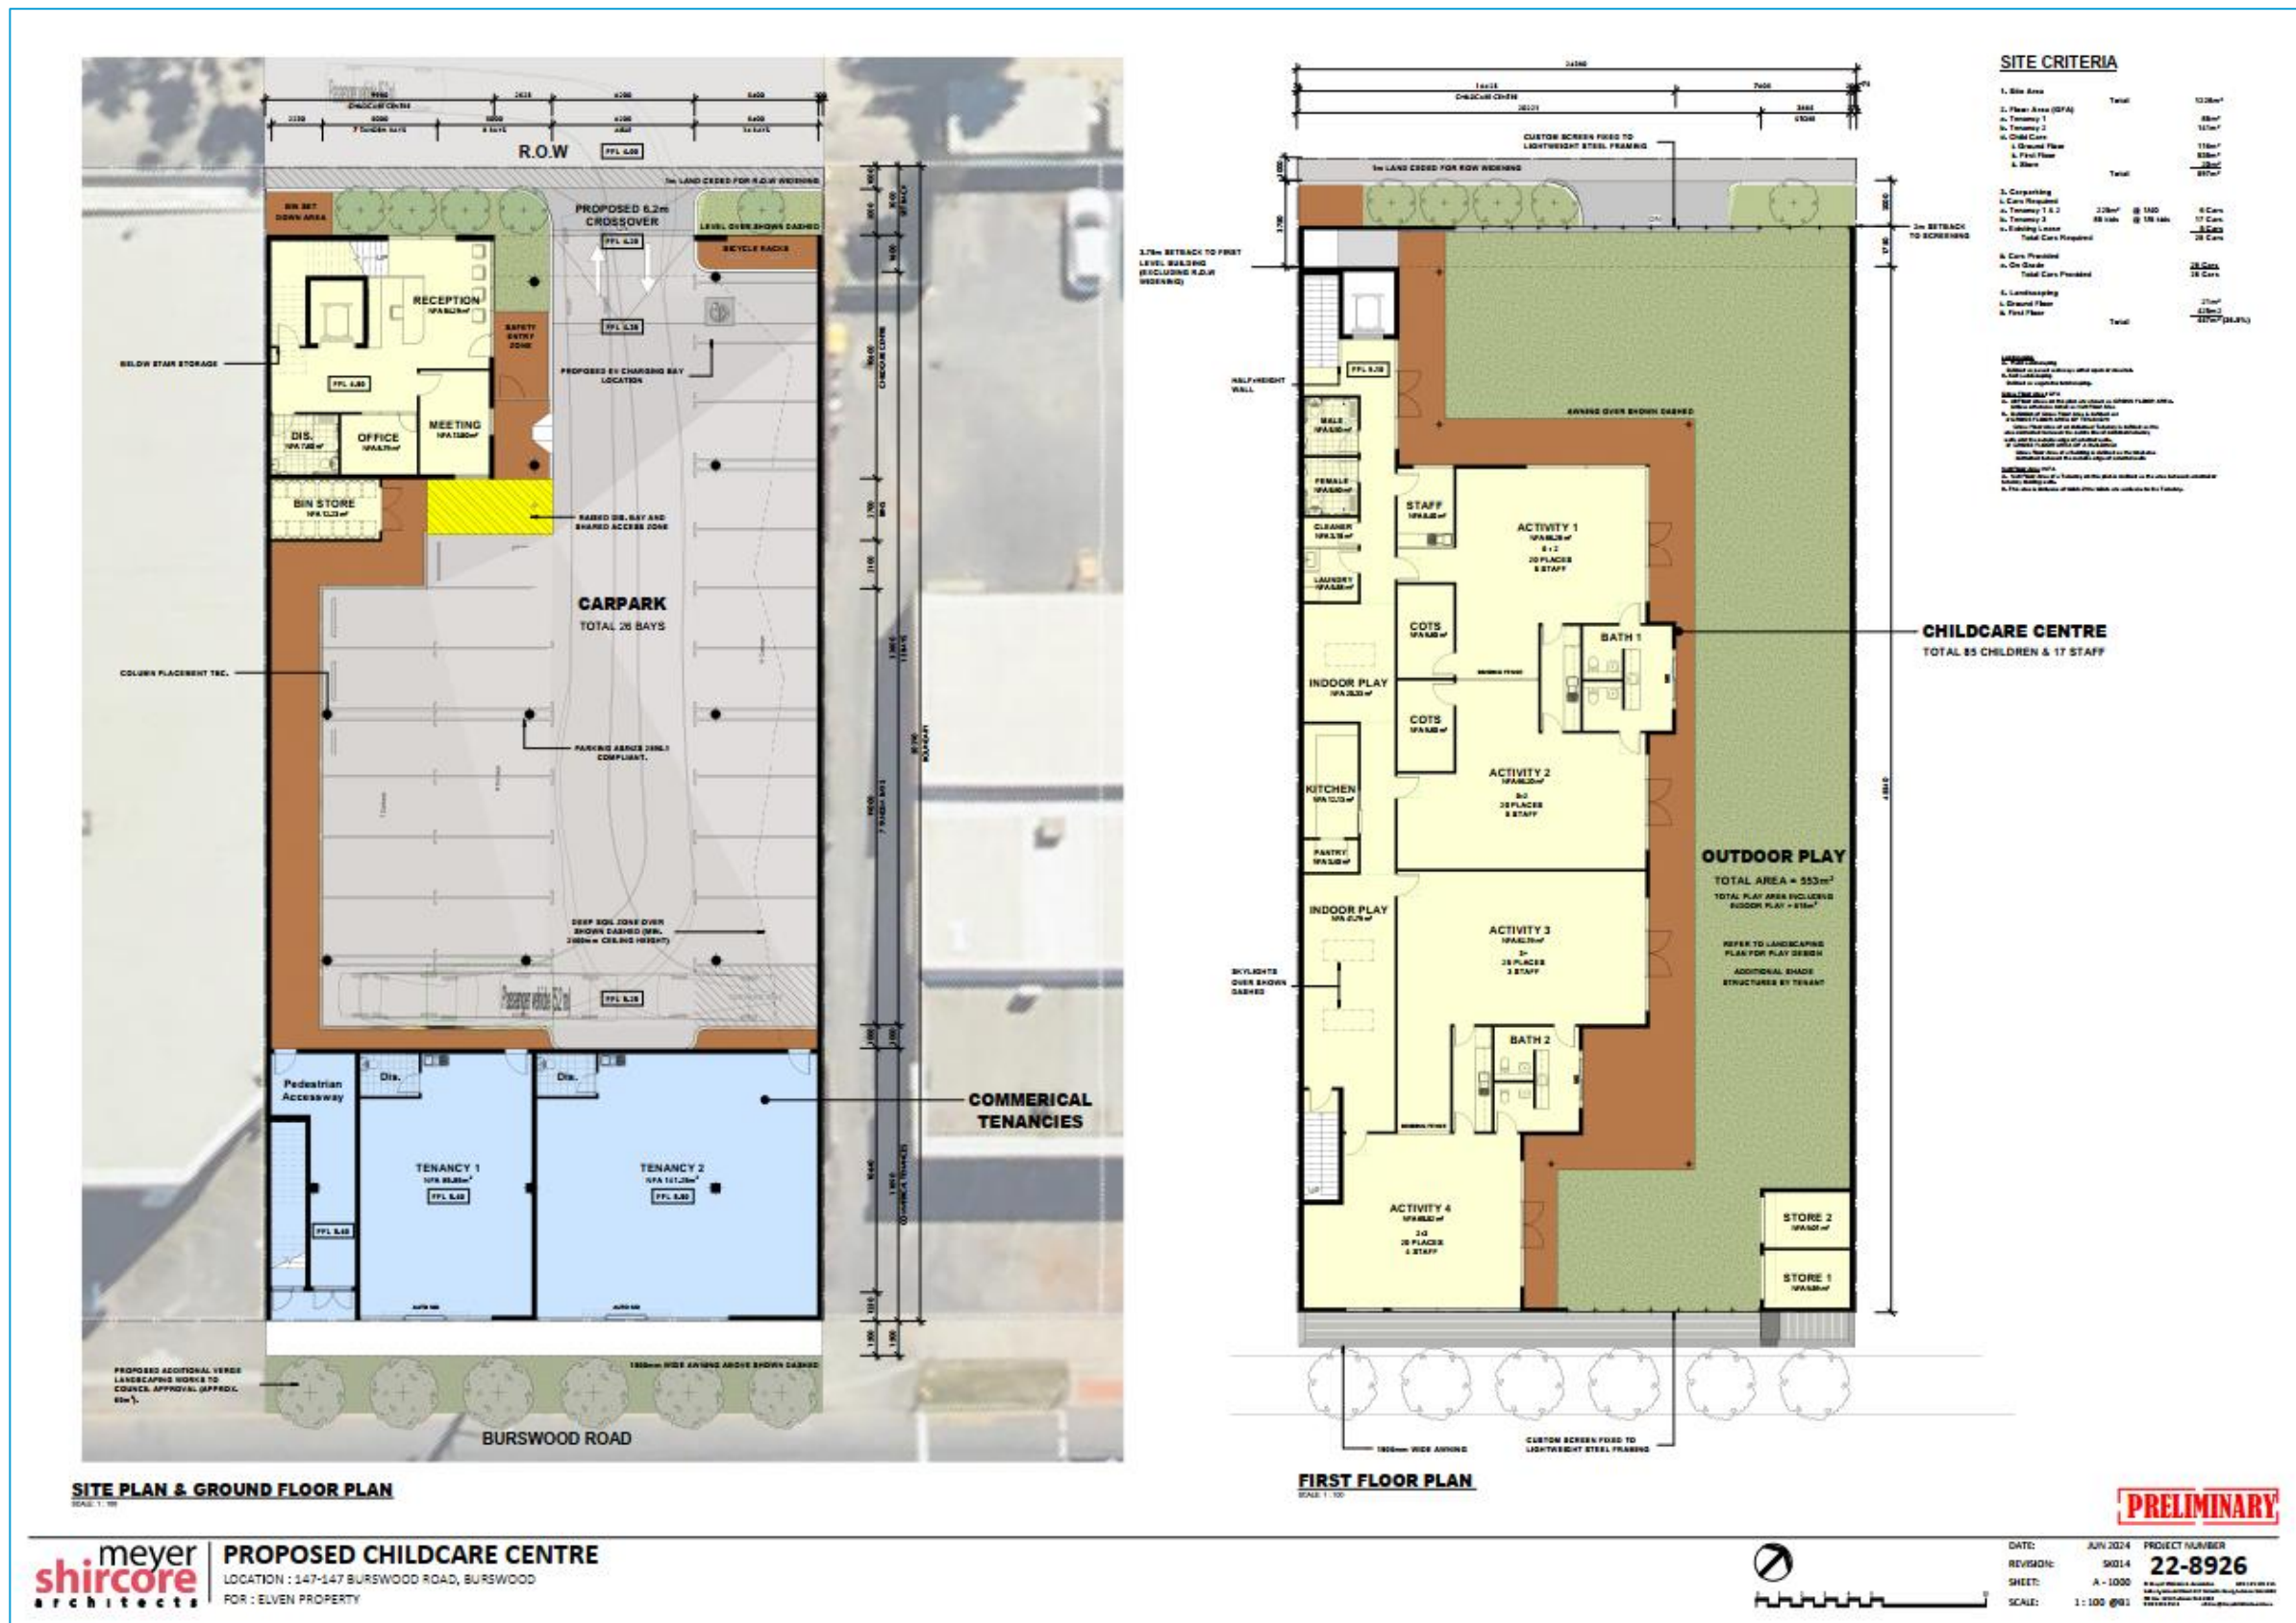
Ground and First Floor Plans – Office and Child Care Centre
